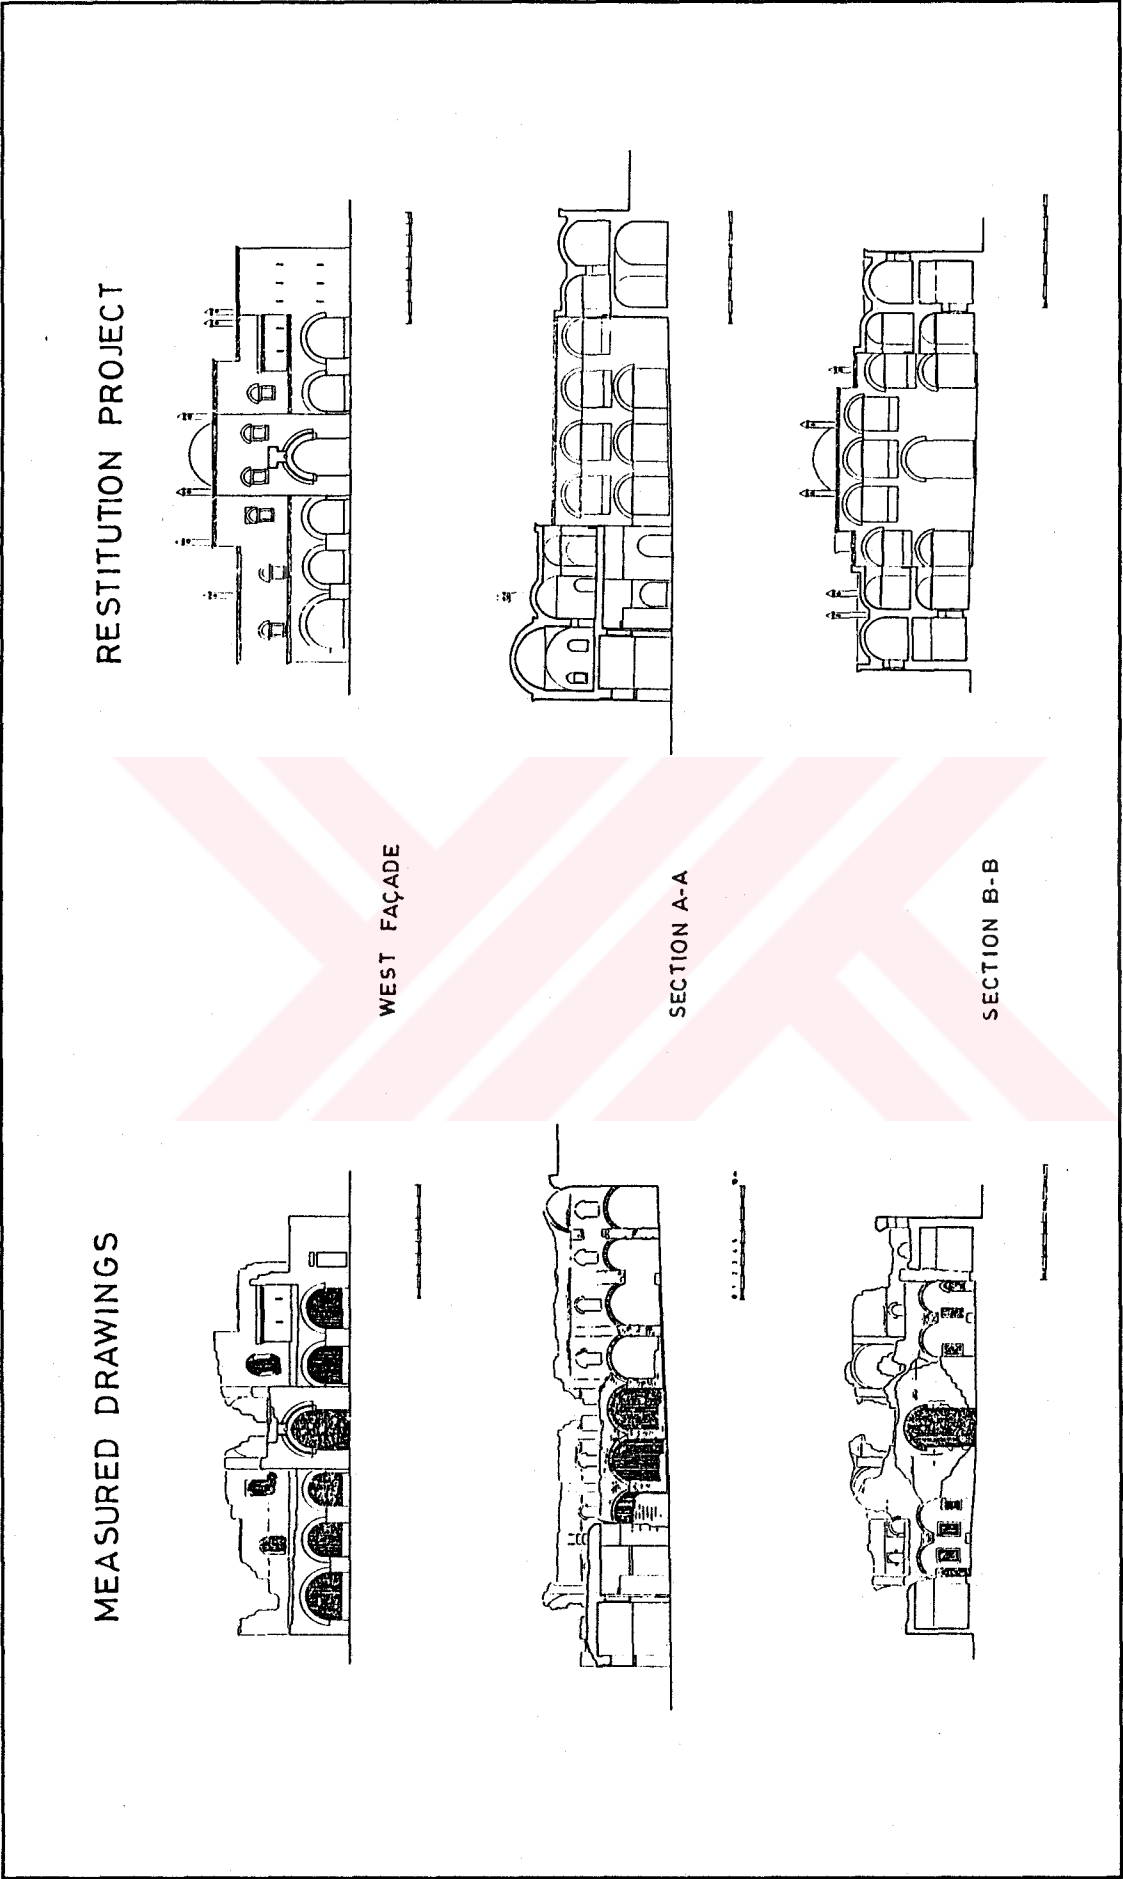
Kanuni Caravanserai in Çeşme - Façade and Section Drawings
